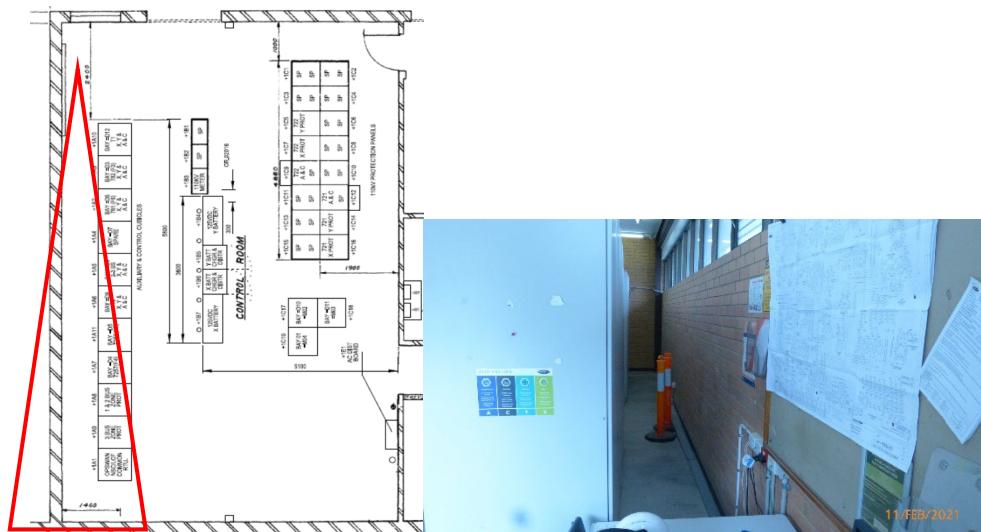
Substation Secondary Systems Building +1 Internal View 1.
